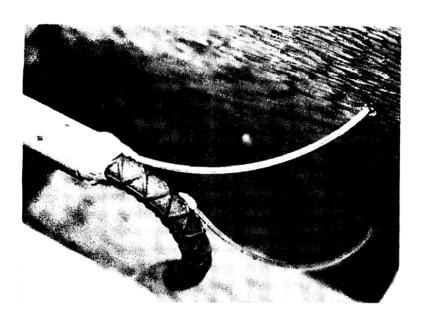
Wire Encased in Tube and Cast in Specimen [1].
